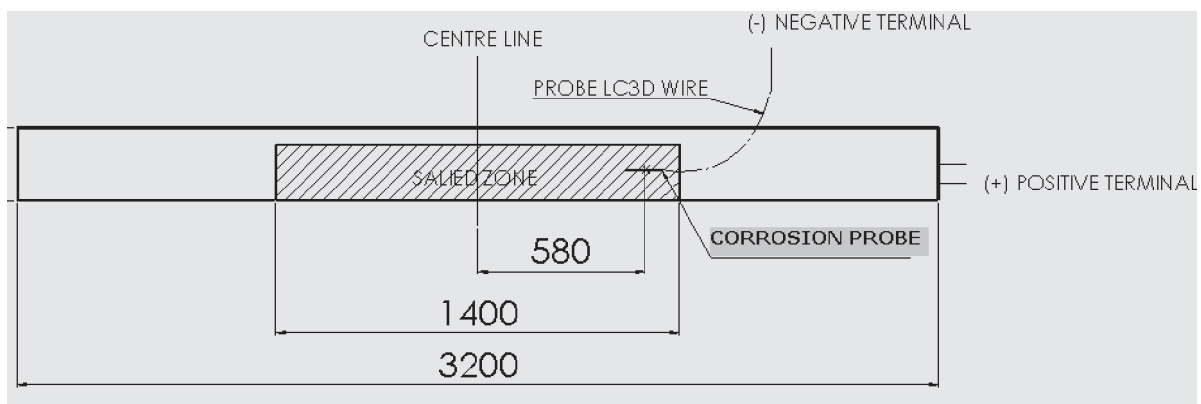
A schematic for the location of a corrosion intest specimen [39].
